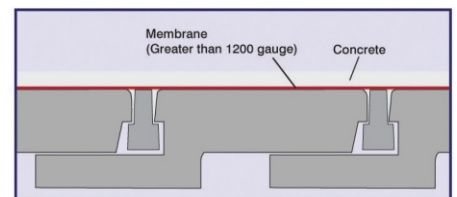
Floor construction using the F/T panels with rigid membrane barrier
